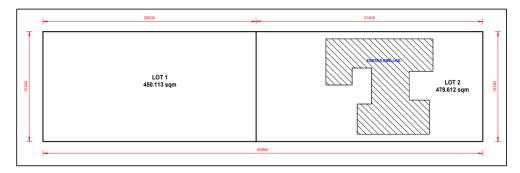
Proposed subdivision plan - 126 Addison Street Goulburn
